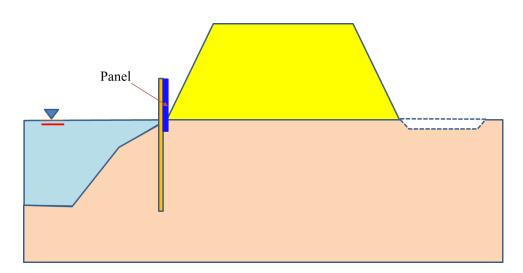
Details of precast concrete post and precast concrete panel for Type C
